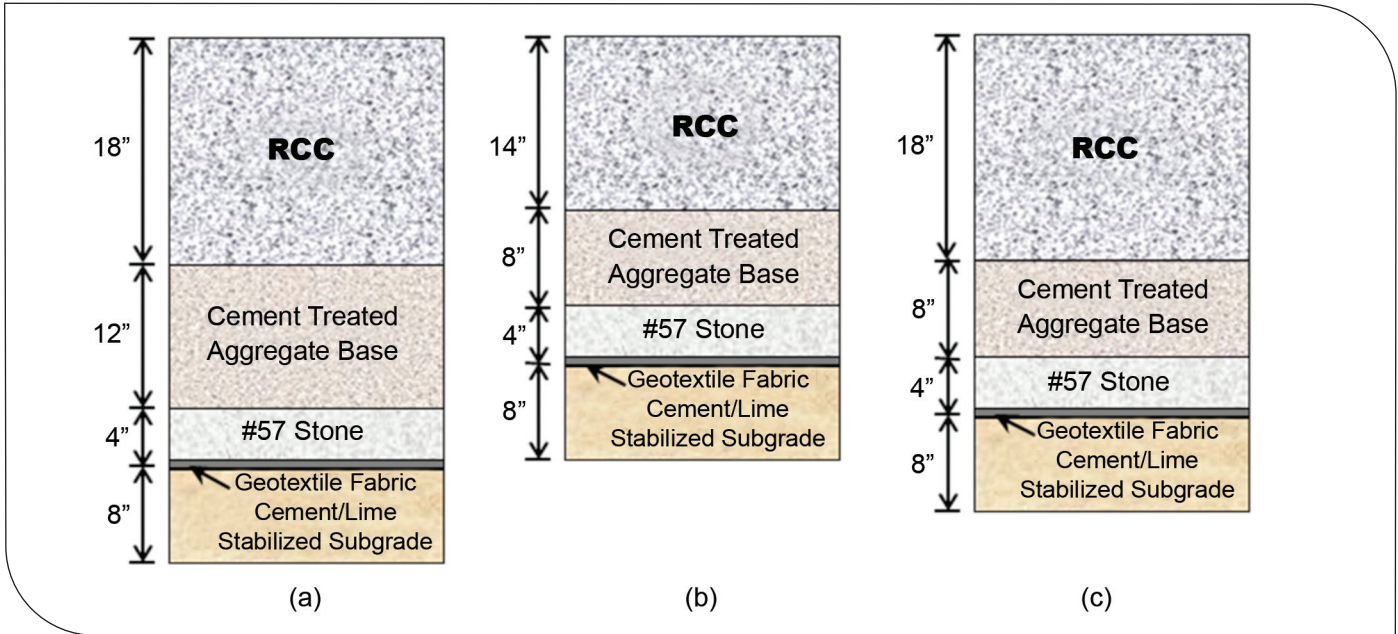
Pavement sections: (a) Grounded container storage; (b) Wheeled container storage; and (c) Circulation roads
